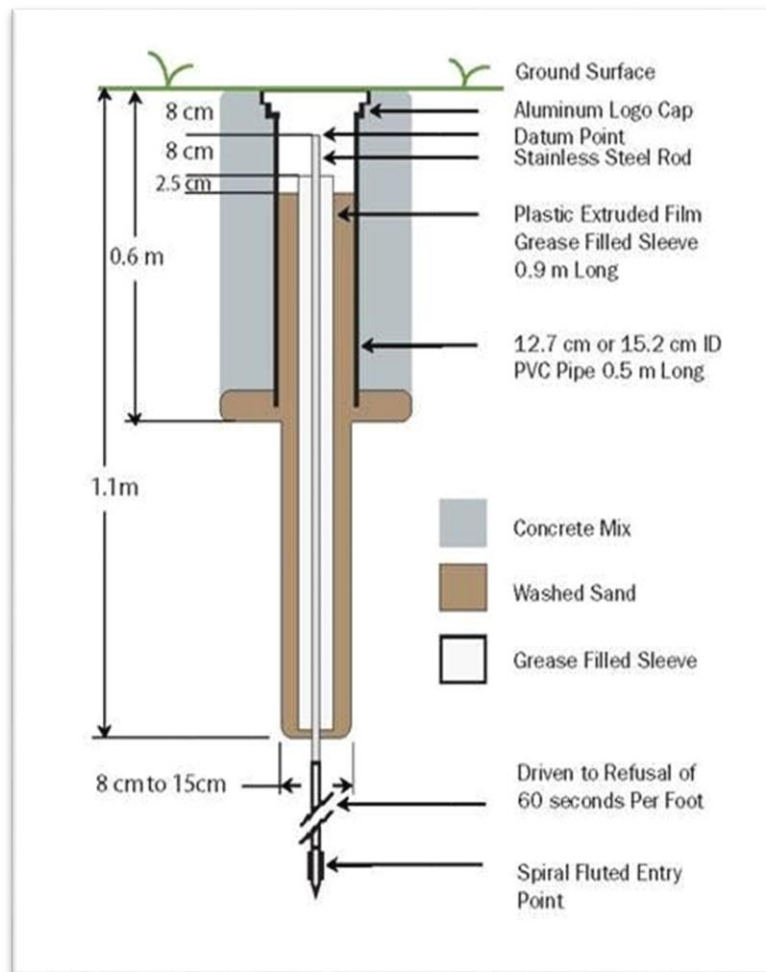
Diagram showing components and dimensions of a typical deep rod mark (from Smith, 2010).
